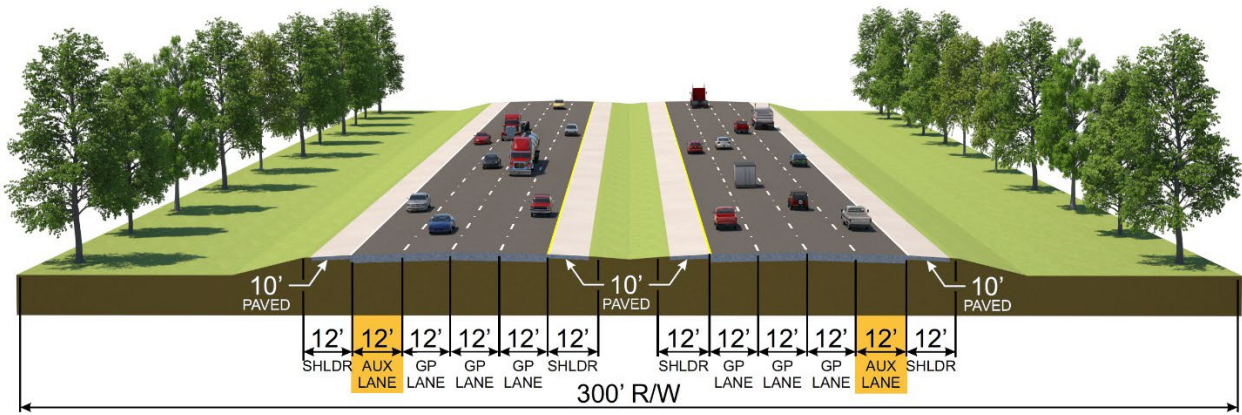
| Auxiliary Lanes Alternative Typical Section
